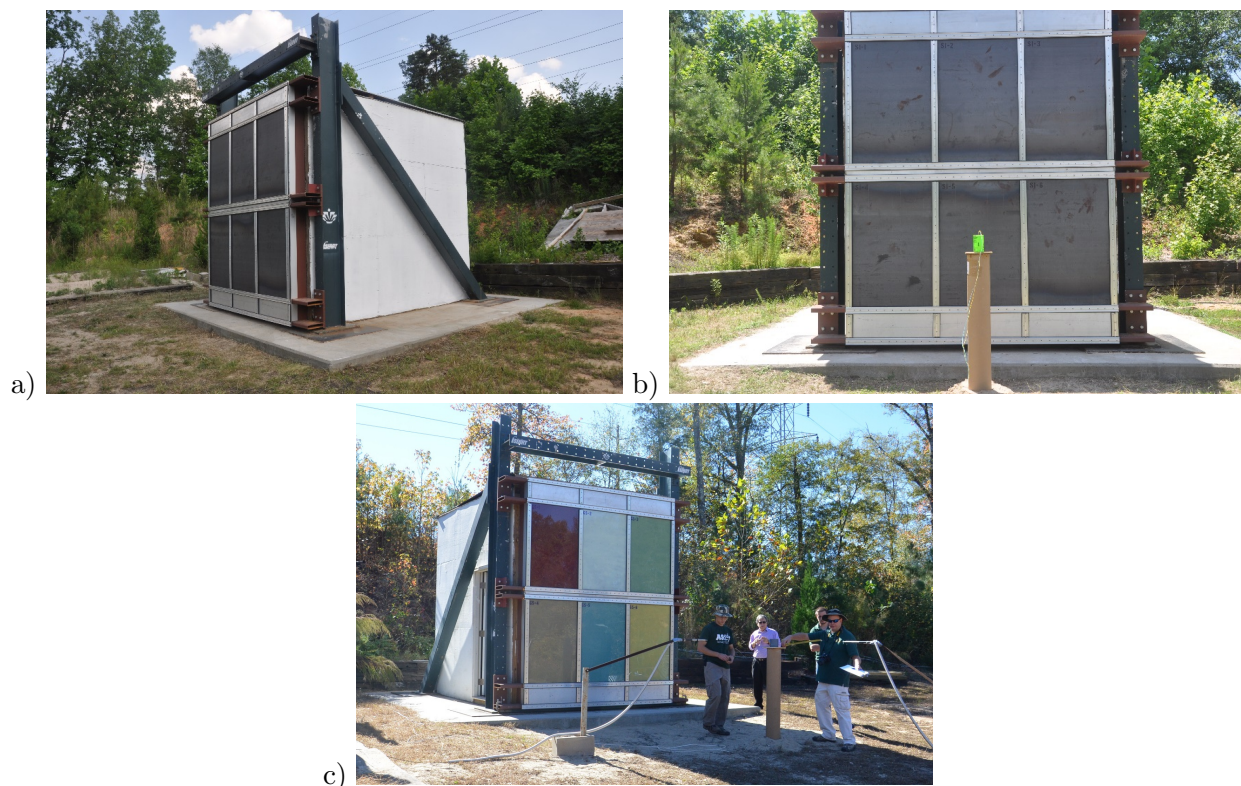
Photographs of experimental test setup developed at the UNC Charlotte ISERRT Facility: a) Reaction frame and enclosure; b) steel panel specimens installed in frame; c) glass lite specimens installed in frame
